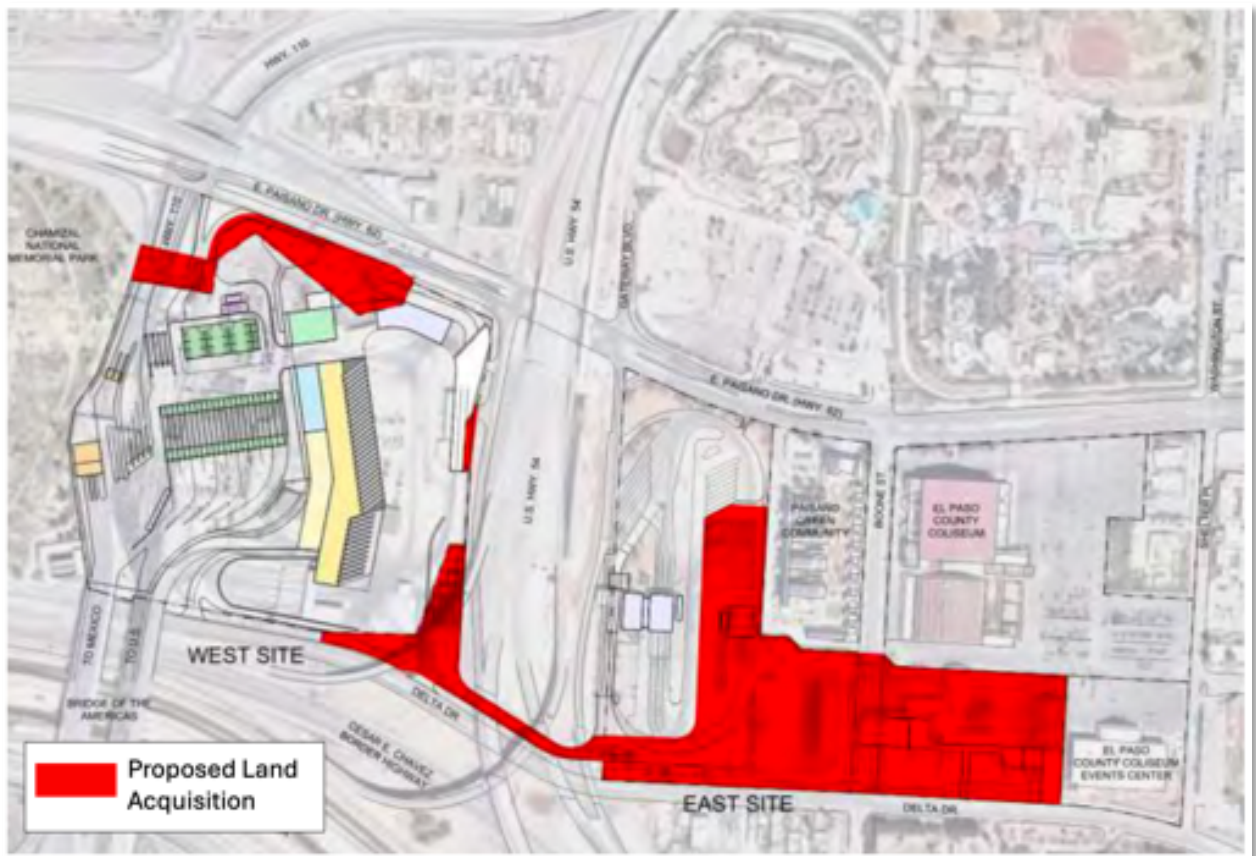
Possible Action Alternative 1 Site Design/Layout and Land Acquisition.
